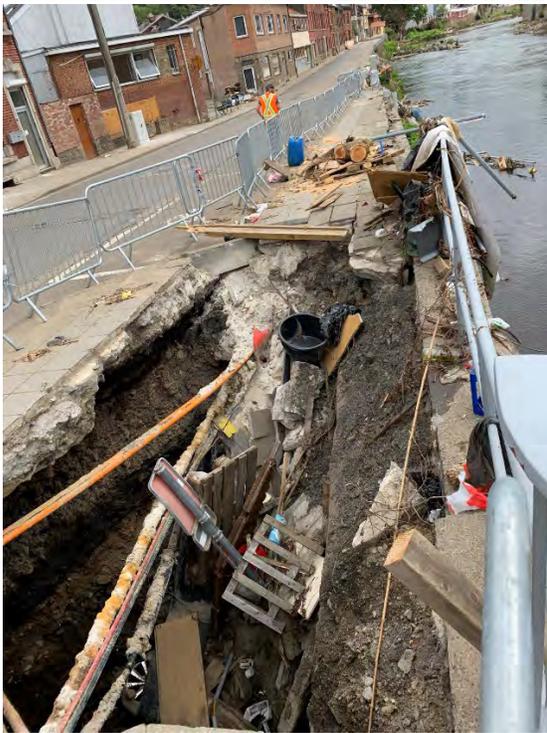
Pont du L'honneux damage: left embankment wall in upstream direction(50.609966, 5.6194468).
